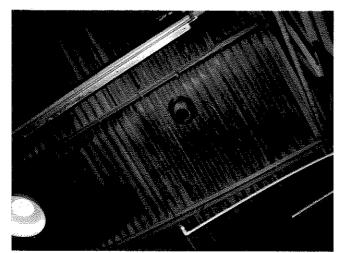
One of four exhaust pipes in the ceiling of the Drill Floor
